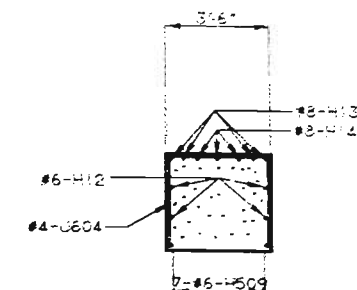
DETAILS OF INT. BENT NO. 3 (NORTHSOUND LANE)
